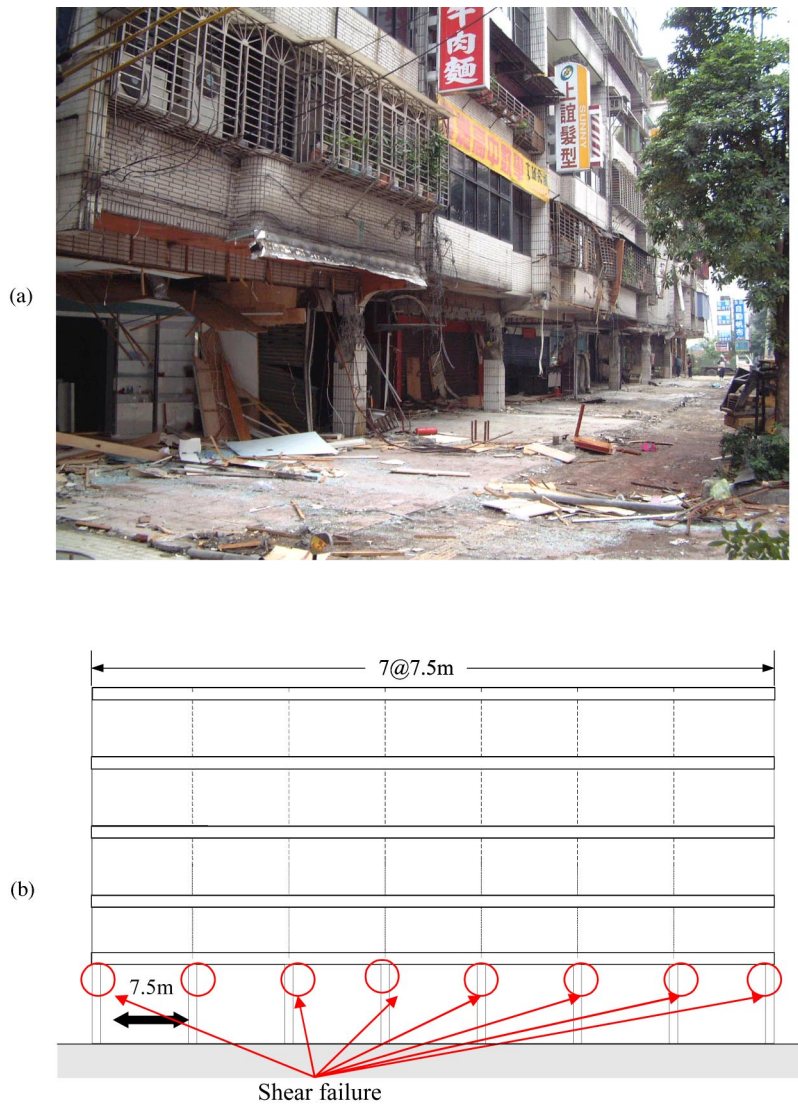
(a) Photo of a damaged 5-story building with seven units in a row, and (b) schematic diagram of the building in (a) and the damage locations of the columns along the corridor.
